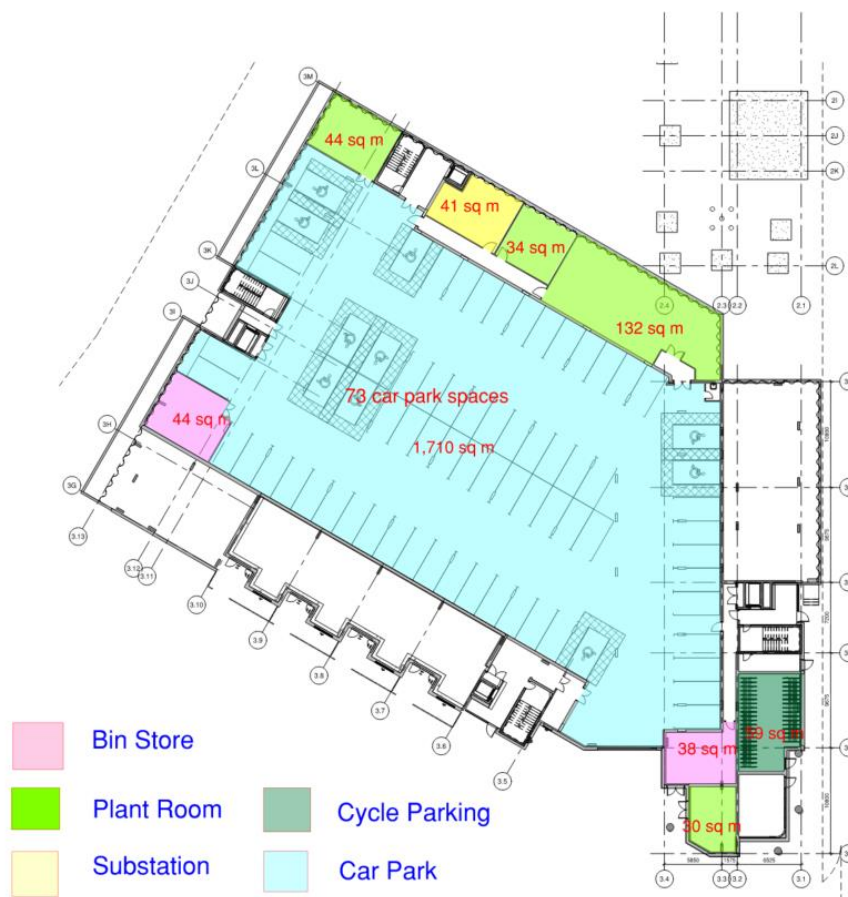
Block 3 Basement Floor - Ancillary and Non-Residential Areas
